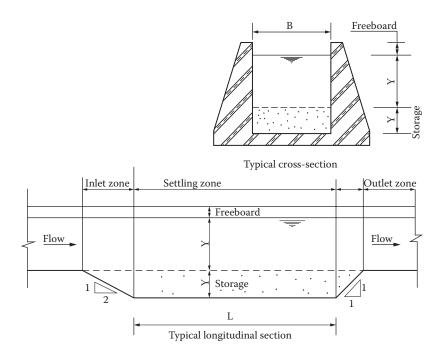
Typical cross-section and longitudinal section of a settling basin.
